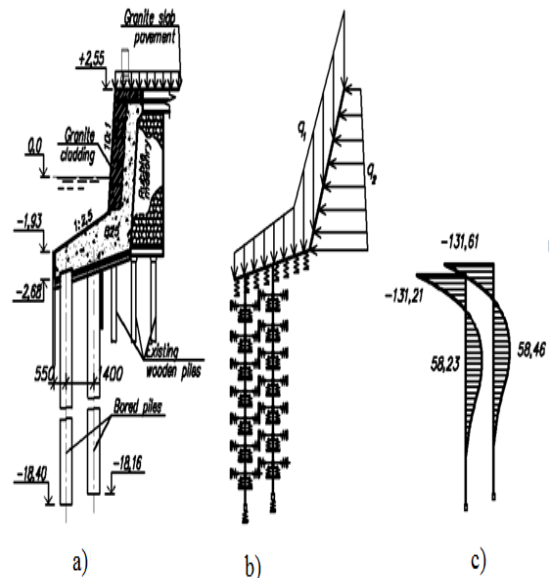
a) Cross-section of piles grillage. b) Design scheme. c) Bending moment of the diagram in piles.
